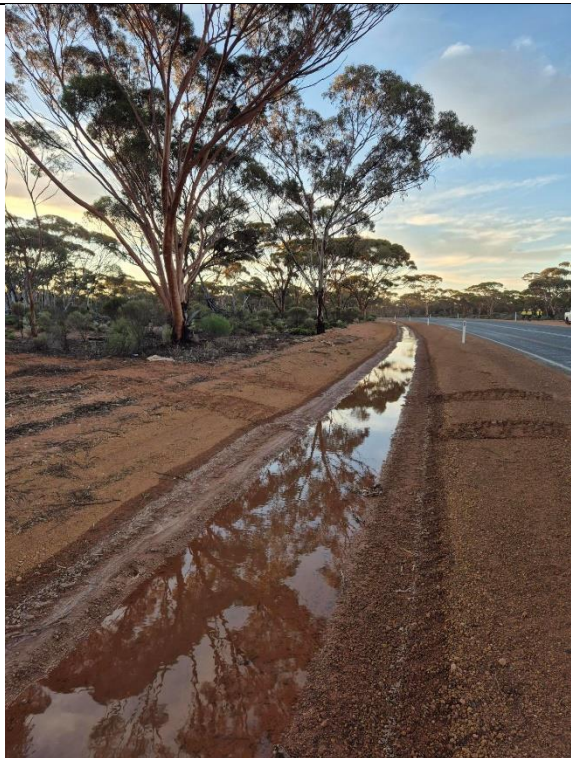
Water from the trench overflow toward the V drain on the side of the road
